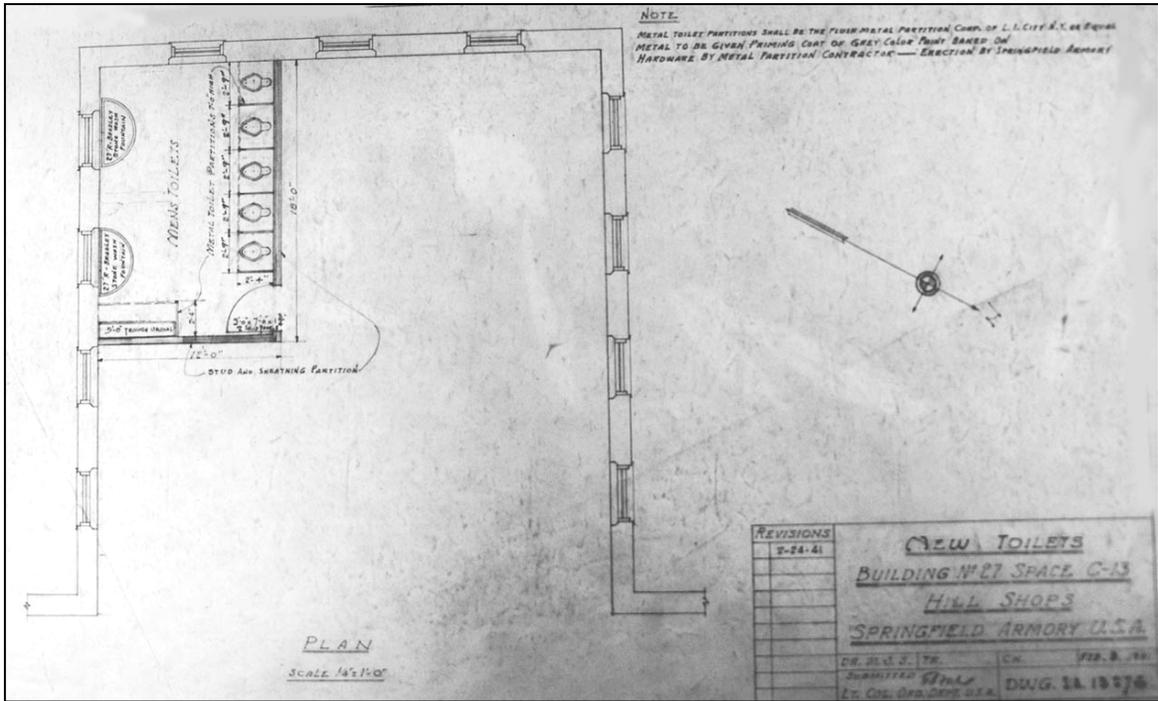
New Toilets, Building No. 27, Space C-13, Hill Shops, Springfield Armory U.S.A., September 24, 1942. Restrooms added to the second story of the west ell.
